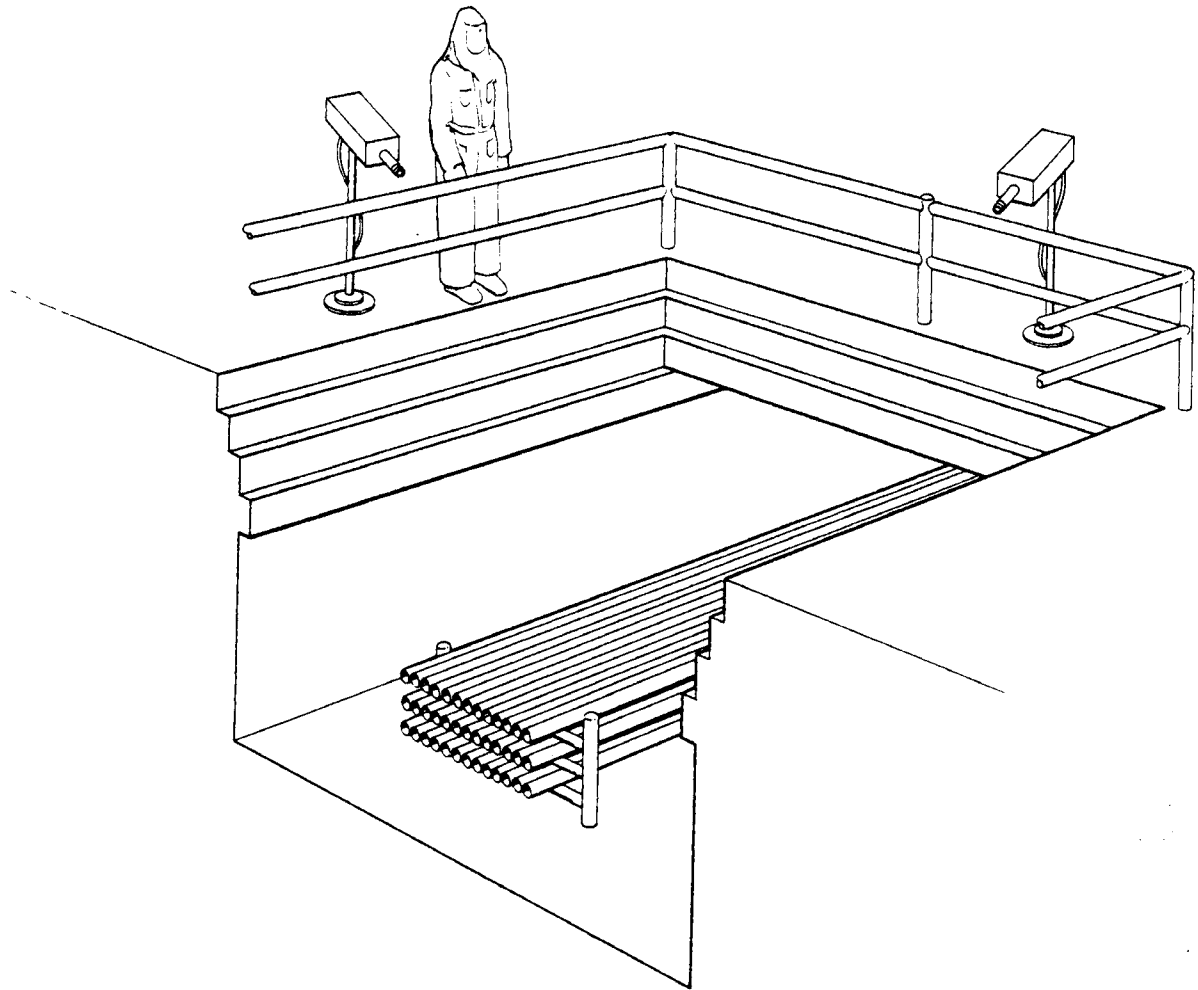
Process Pipe Trench with Piping to be Sectioned
